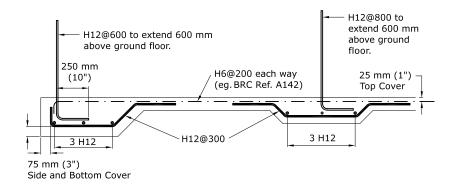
REBAR LAYOUT OF SLAB-ON-GROUND FOOTING (MASONRY WALLS)
